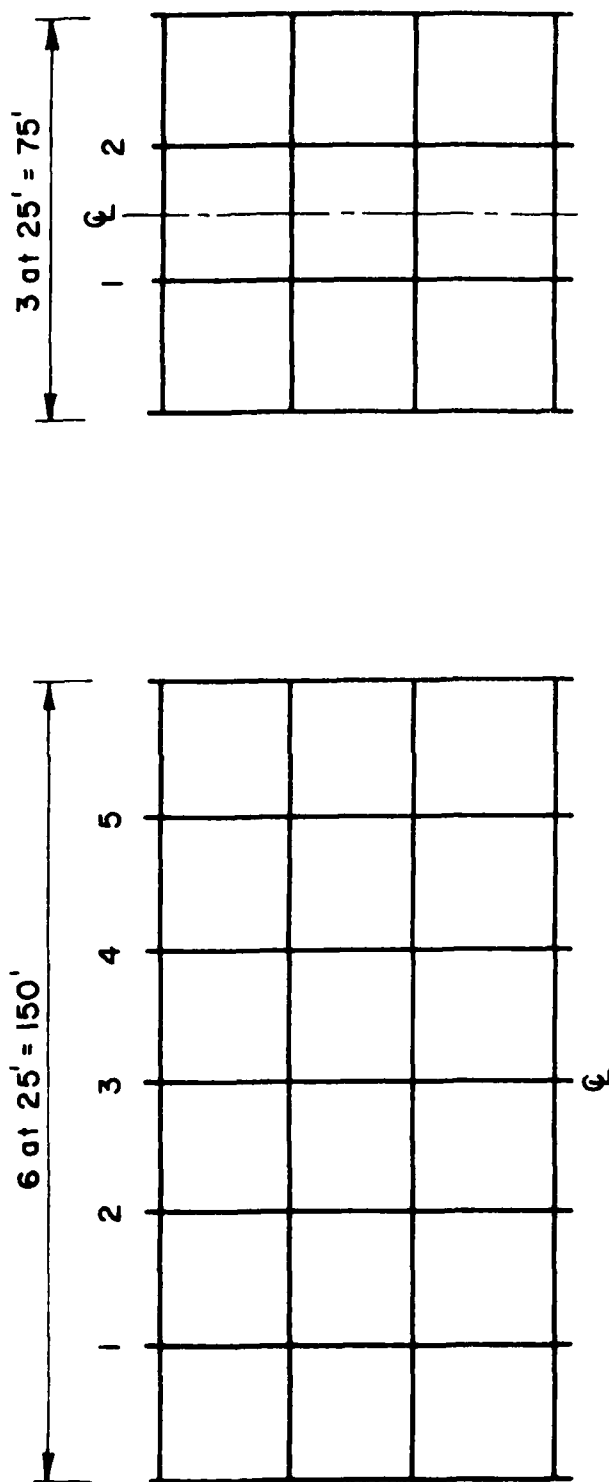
Typical Failure Patterns in Pavement Sections of O'Hare Airport.
